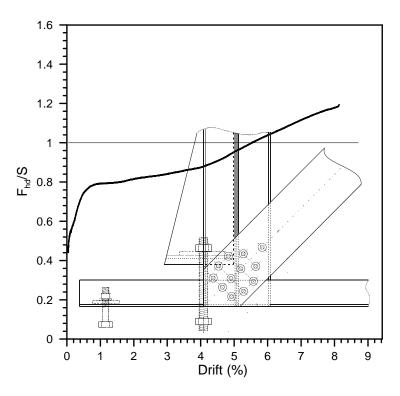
Light wall configuration with raised holddown placed outside of the chord studs
